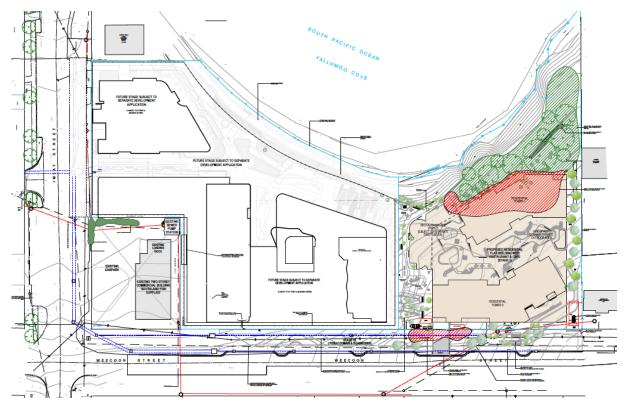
DETAILED SITE PLAN – STAGE 1:
